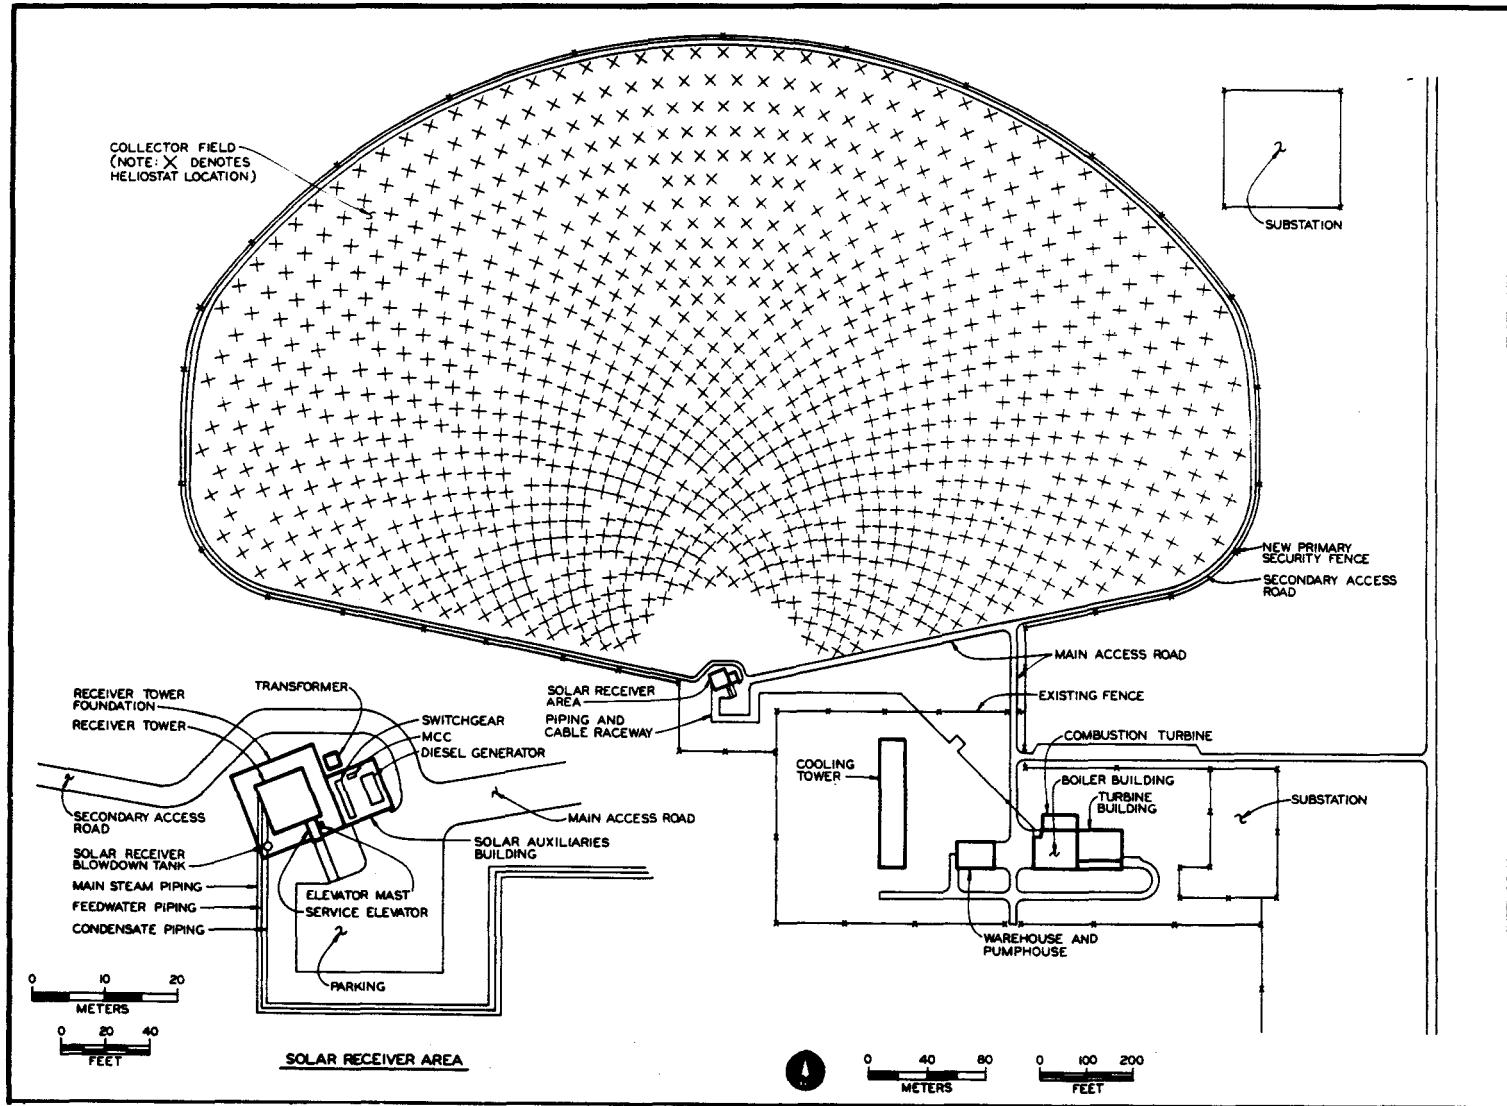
SOLAR COGENERATION FACILITY SITE ARRANGEMENT
